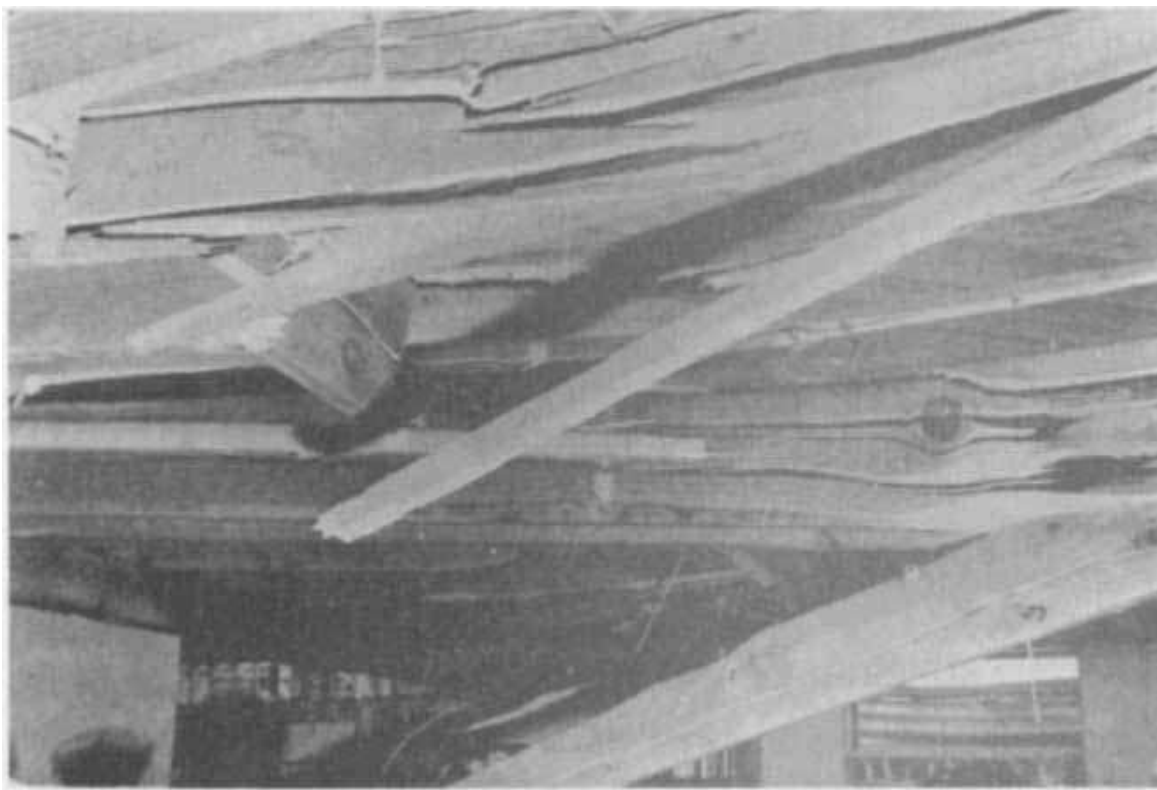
The first floor joists of a strengthened wood-frame building that has been subjected to a 4-psi blast from a nuclear detonation. If the building structure had not been strengthened, the blast would likely have caused it to collapse. At the 4-psi range, the light from the fireball of a 1-Mt detonation could be 500 to 700 times brighter than a desert sun at noon. Such intense light would ignite furnishings and curtains in the building, which could then ignite the rest of the damaged structure. Source: Glasstone (1962).<sup>6</sup>
